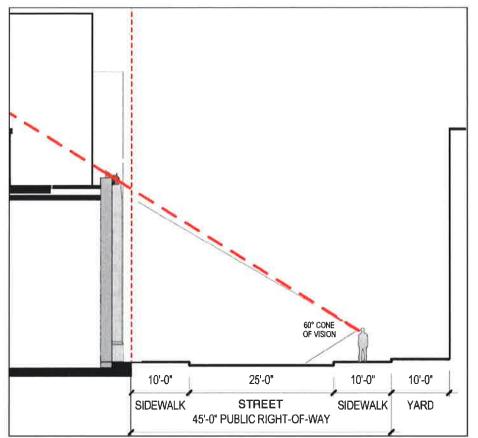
An example of a cone of vision study showing visibility of recessed upper floors from street level.
